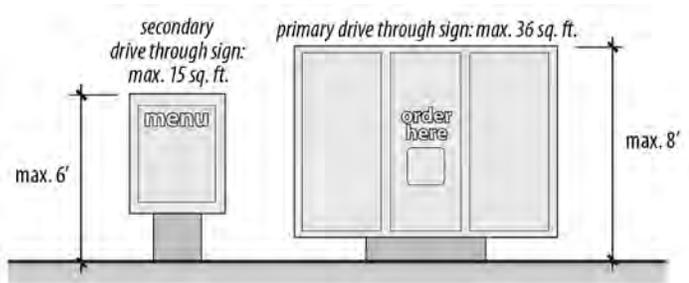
A. Drive-through Sign (illustration will be revised to match monument sign definition--i.e., base as wide as face)
